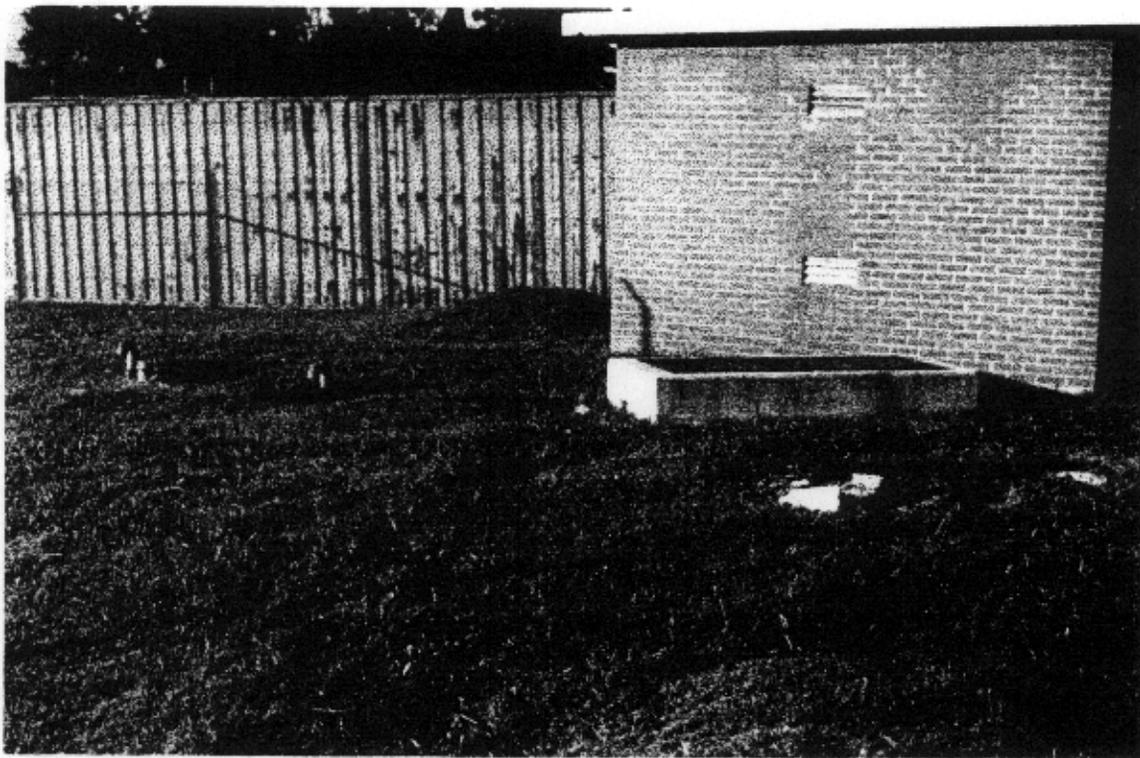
B. Shows manufacture oil separator and grit chamberd.
